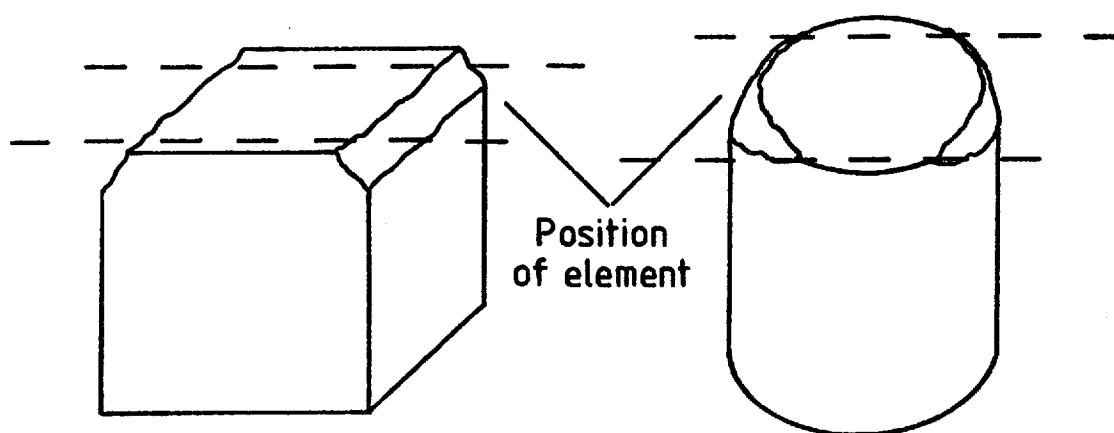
Fractures caused by block geometry in both cuboid and cylindrical samples.
